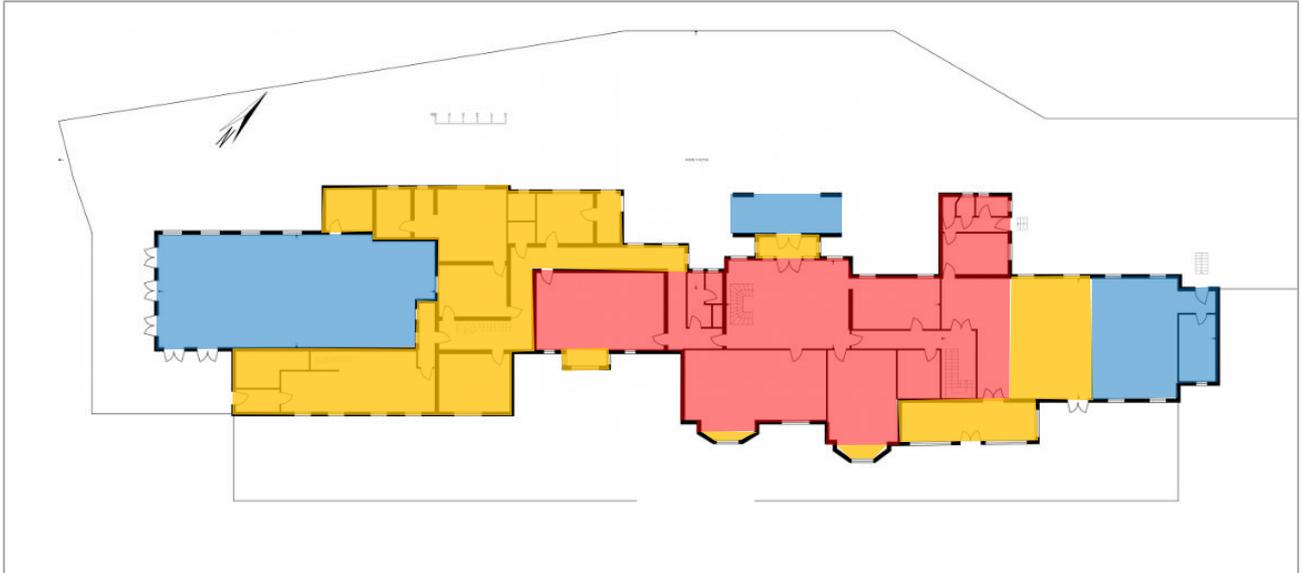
Existing ground floor plan (north toward the top) with inferred main phases.
